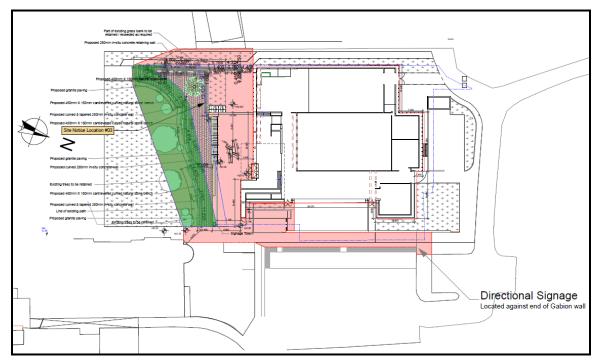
Proposed site layout plan (Source: Carlow County Council).
